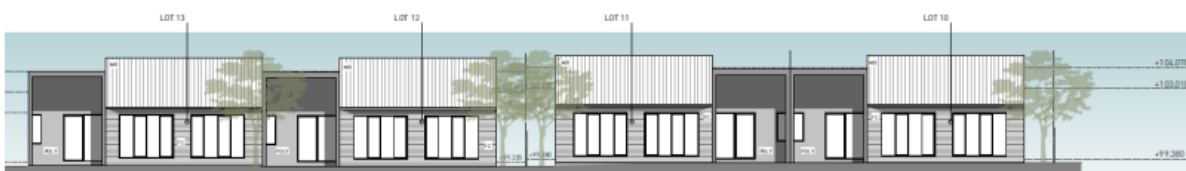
Elevation of Small Lot Housing Presenting to New Entry Road
